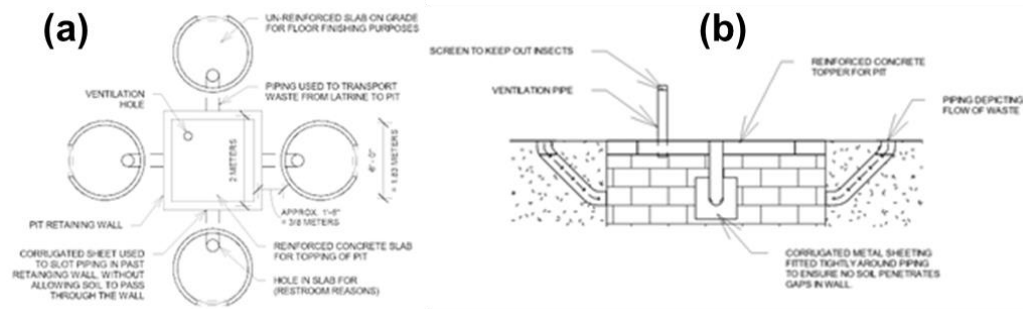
(a) Slab-on-grade view, (b) Design of pipe slotting with corrugated sheet placement.
